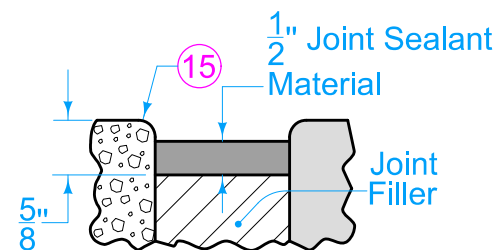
Detail F or Detail G (See Bar Size Table for Doweled Expansion Joints)
